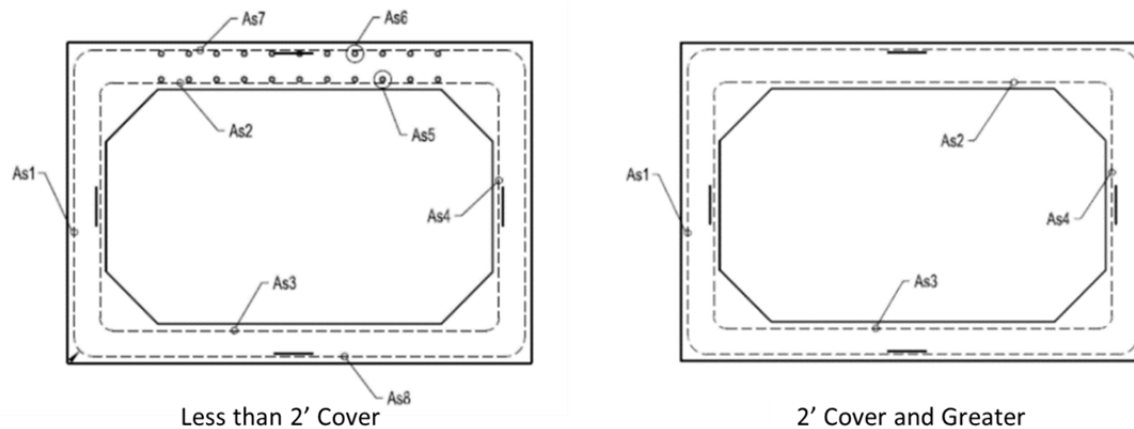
Diagram showing box culvert steel area nomenclature.
